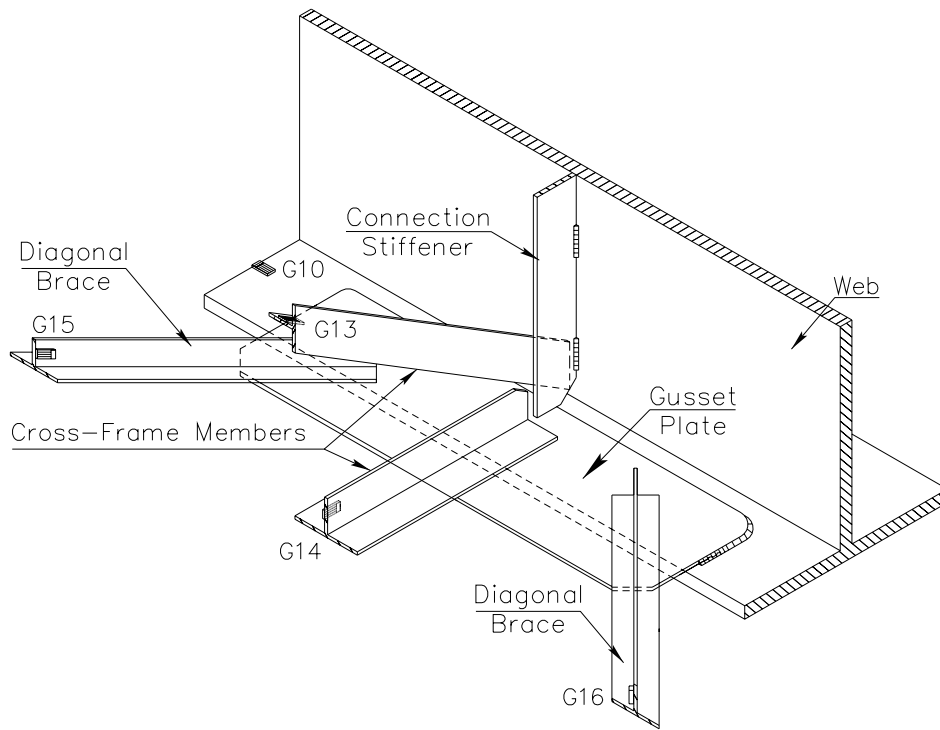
Lower Flange/ Bracing Gages (Diaphragm F2)
